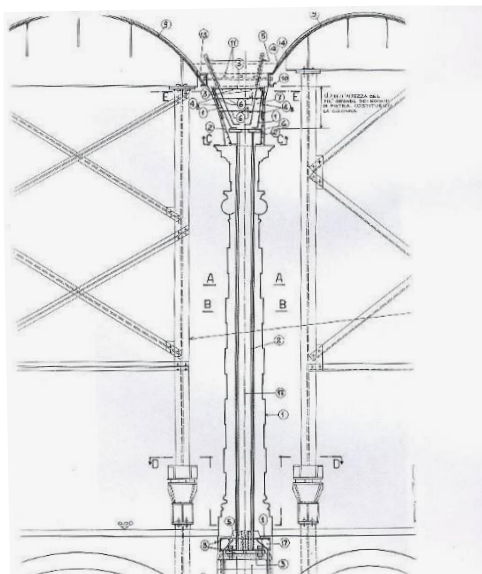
The stone column reinforced with the insertion of the tubular steel column.
